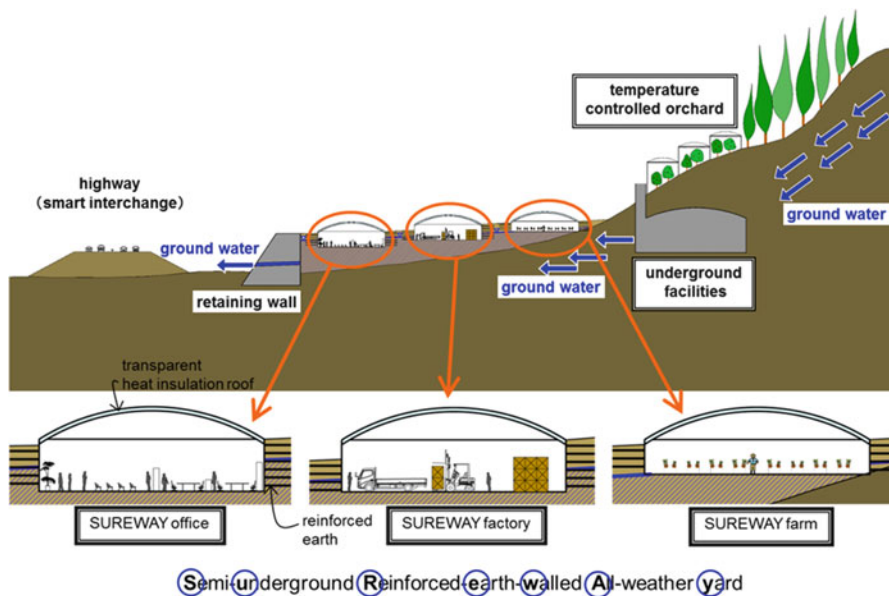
The inland highway with semi-underground facilities (SUREWAY)
